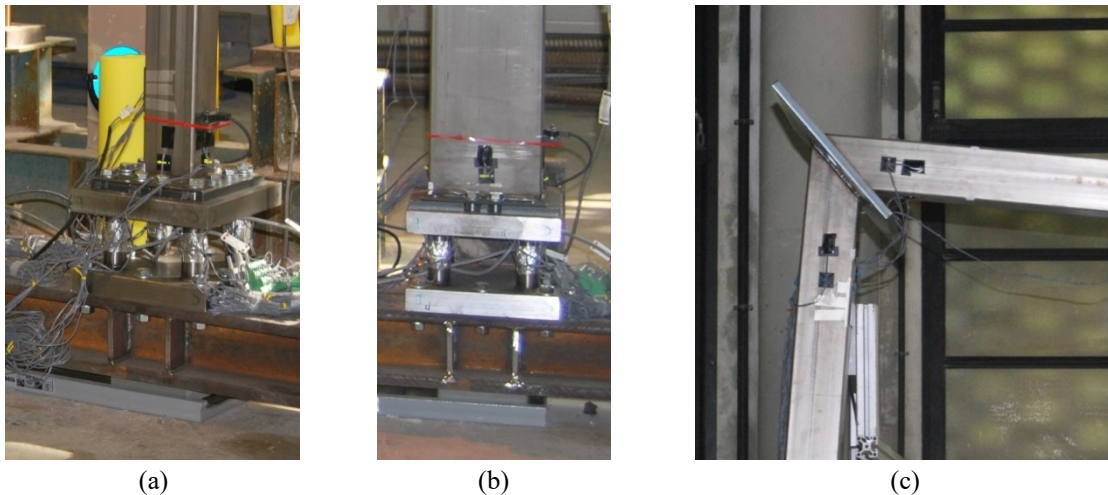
(a) Fixed-ended support (Frame 2); (b) Pin-ended support (Frame 4); (c) beam-column connection.
